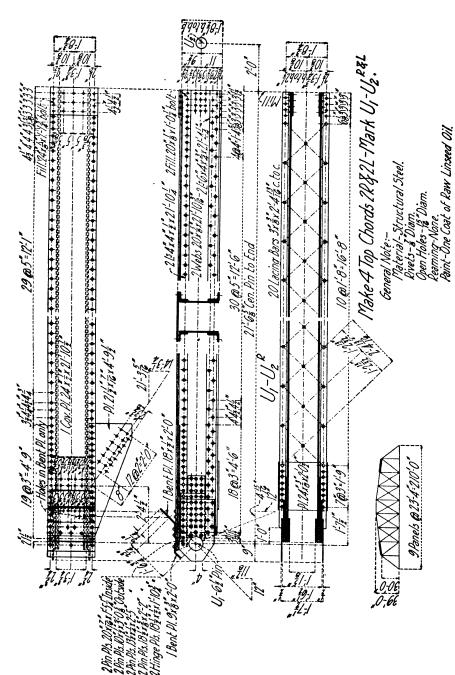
SHOF DETAILS OF TOP CHORD OF A TRUSS BRIDGE.
